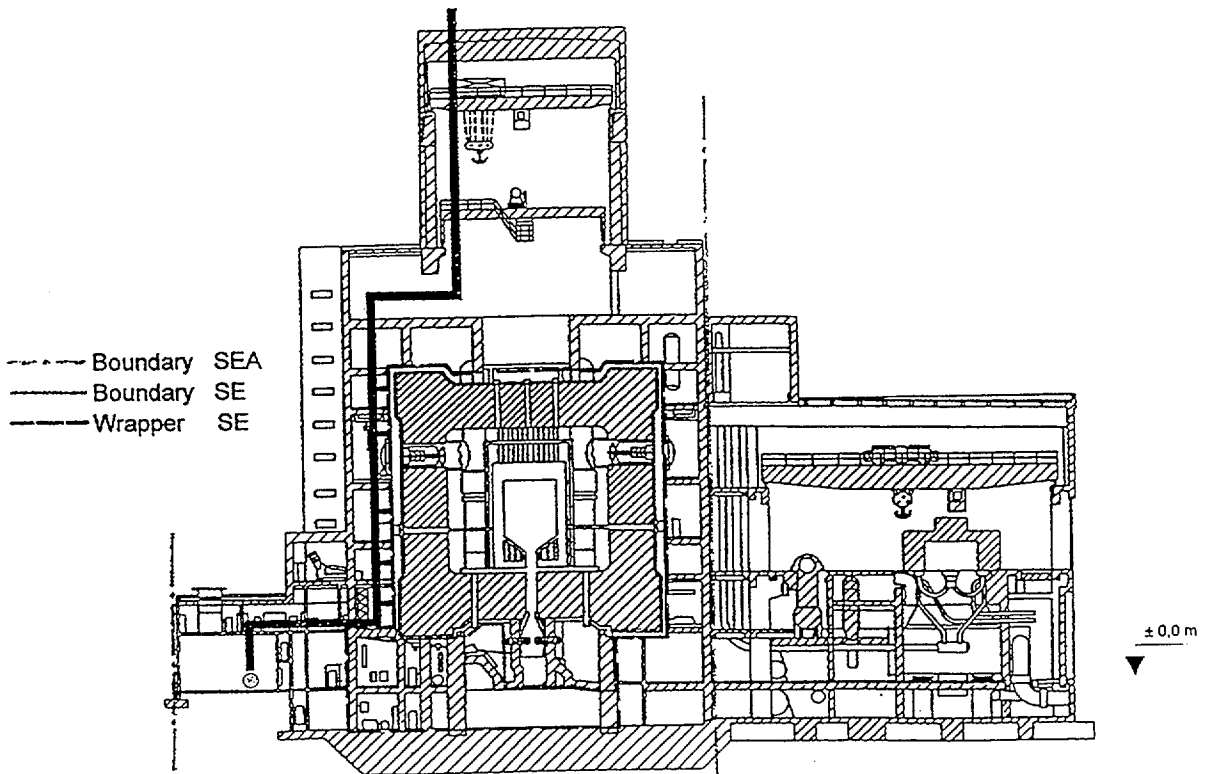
Safe enclosure concept (Reaktor building sectional drawing)
